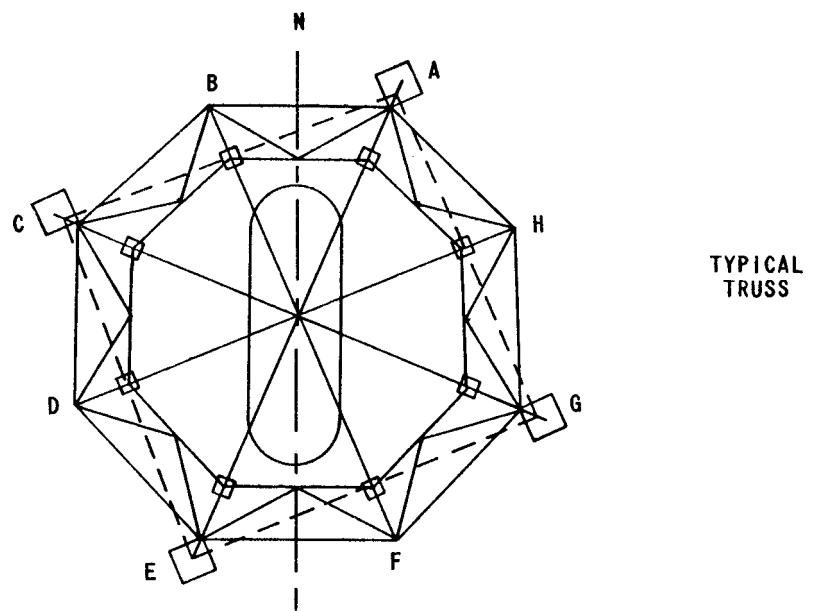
ARRANGEMENT OF SUPPORT STEEL
